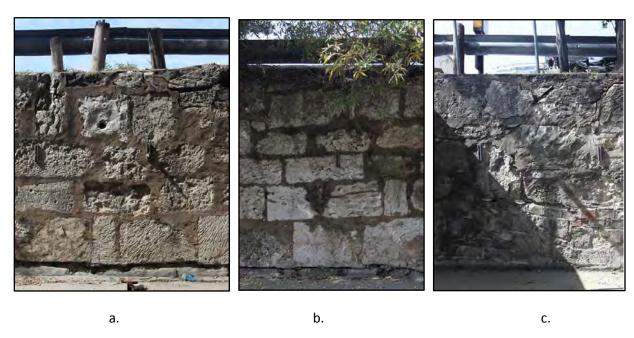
Three distinct styles of limestone block treatment and wall construction along west wall.
